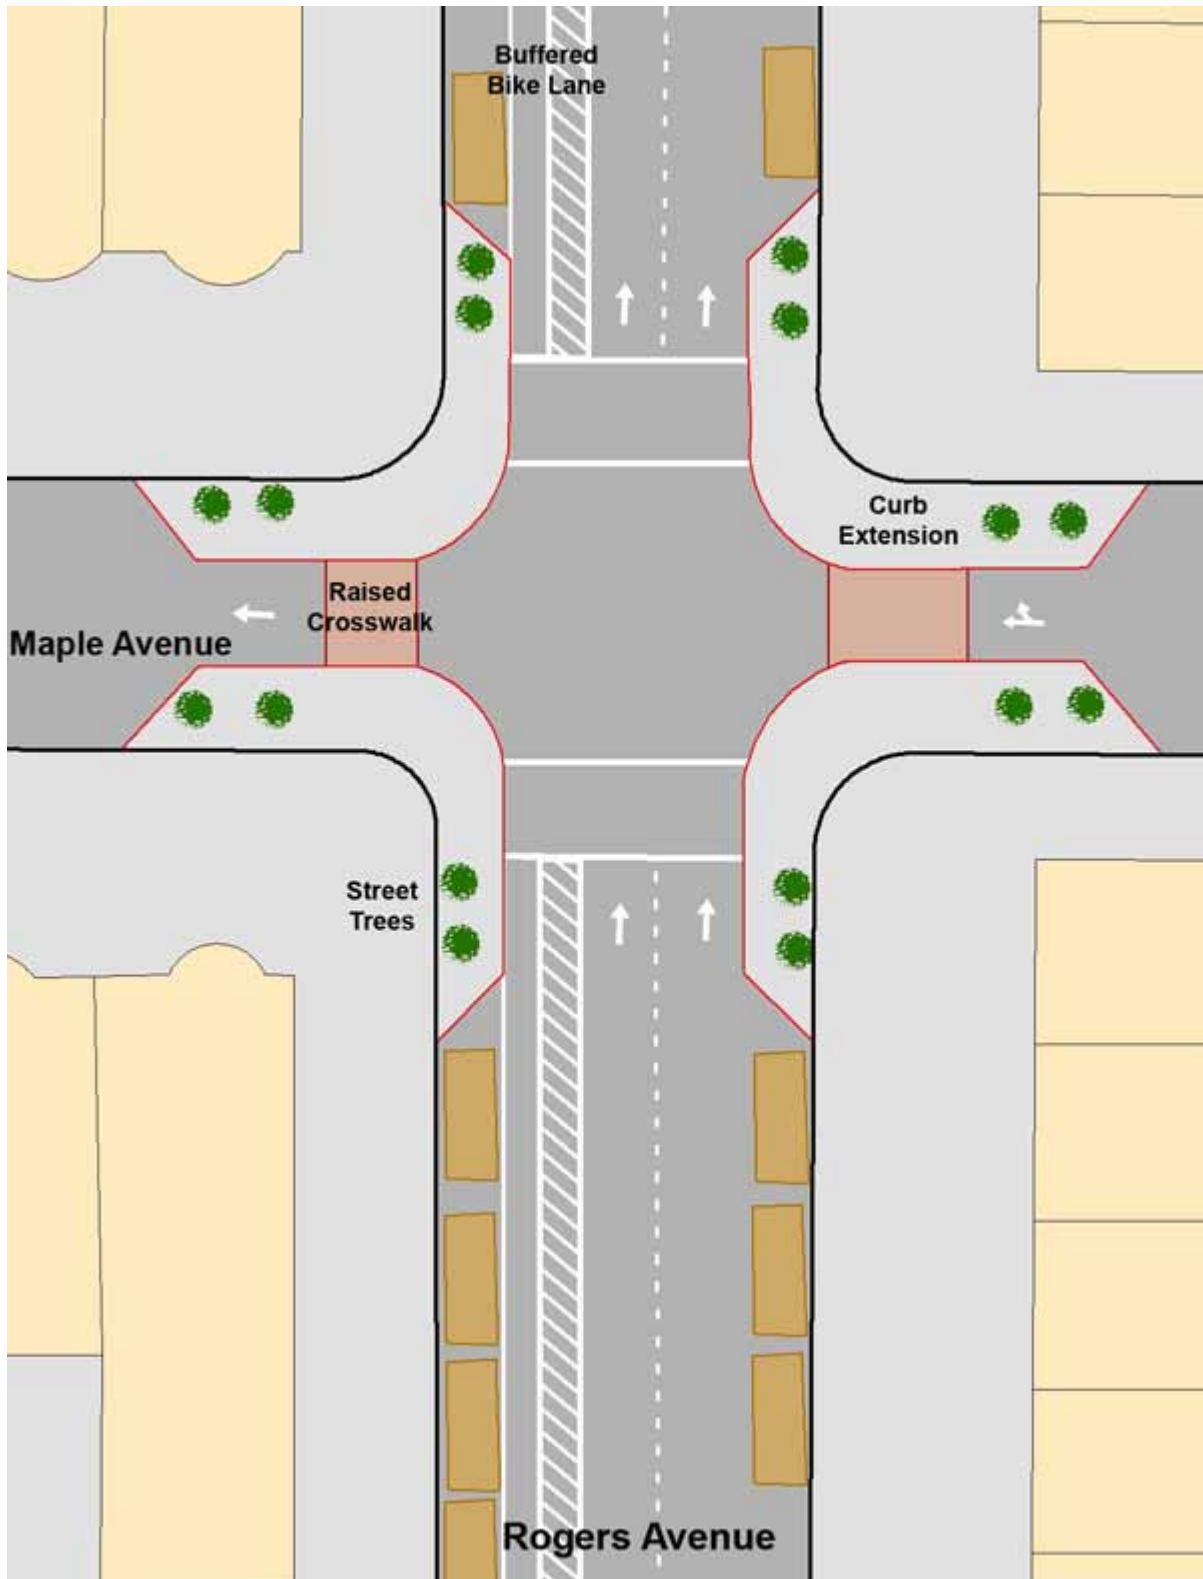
Drawing of Rogers Avenue with a buffered bicycle lane, curb extensions and raised crosswalks
